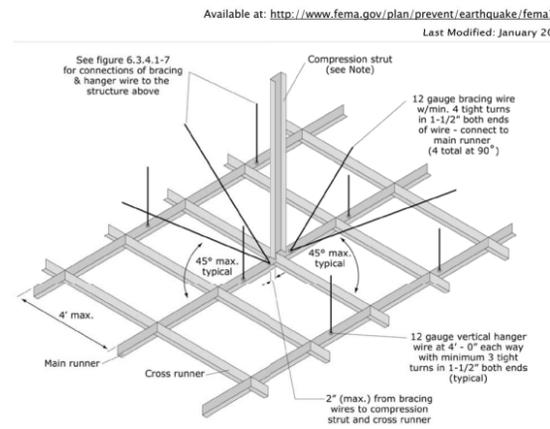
Suspension system for acoustic lay-in panel ceilings - lateral bracing assembly (PR).
